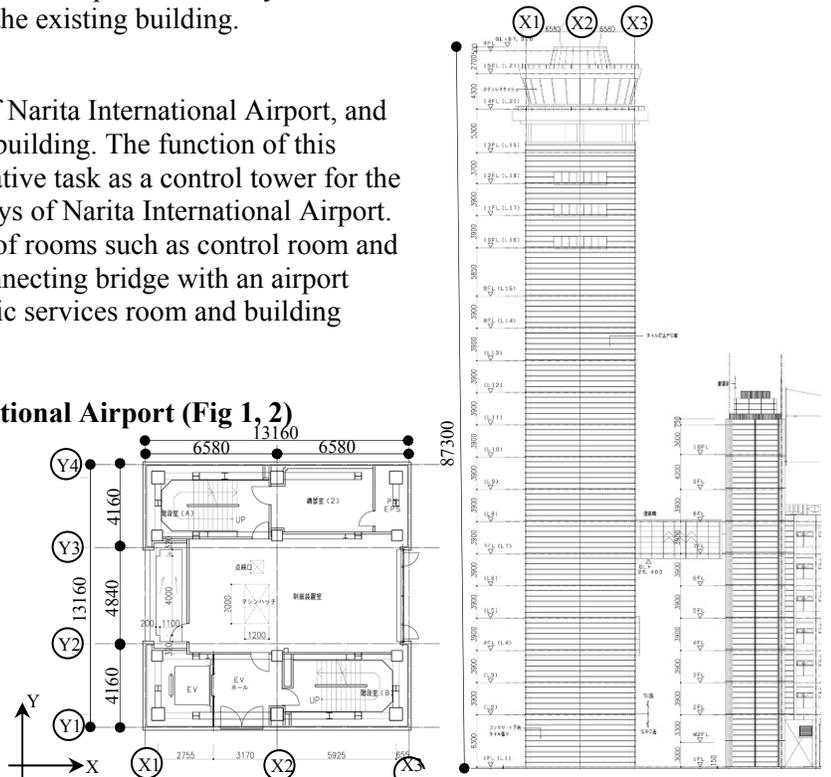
Floor plan for 9F Figure 2. West side elevation view
